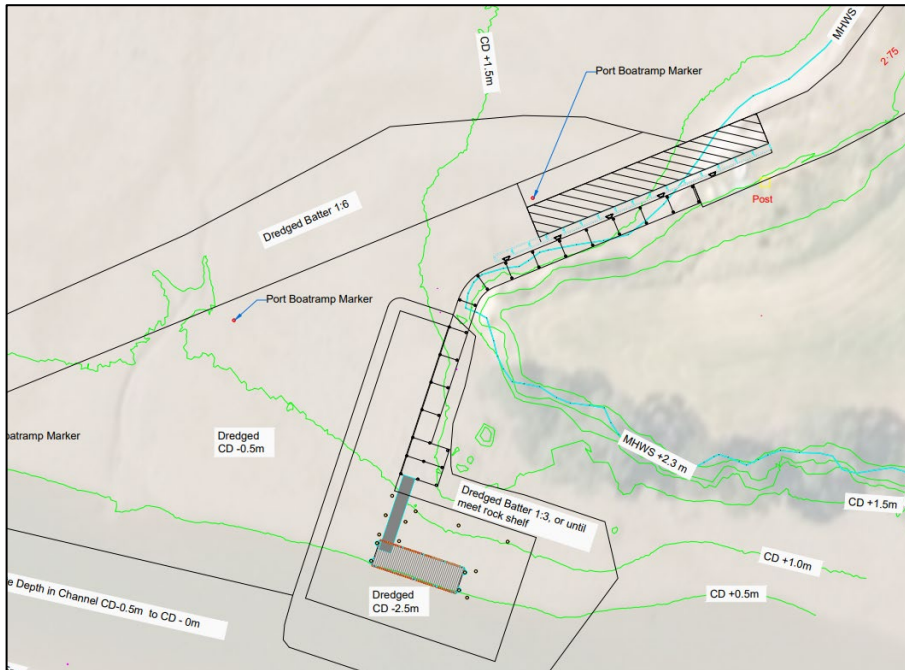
Development Plan [Source: Johnson Bros Limited]
